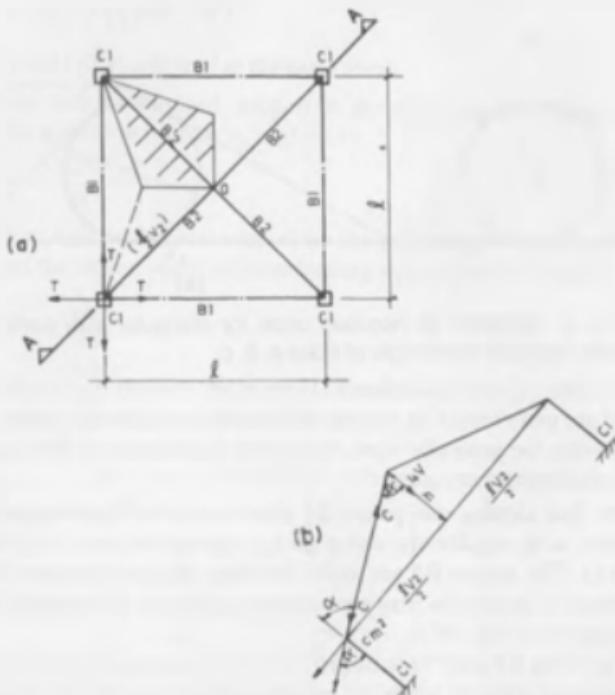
Pyramidal roof on square plan with sloping beams. (a) Plan of roof; (b) Section A-A through a diagonal.
